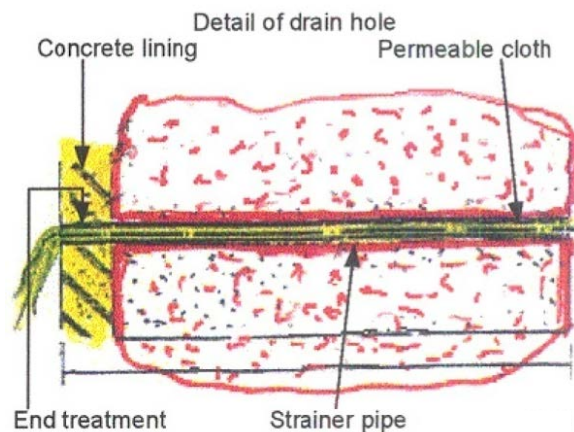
Radial drainage hole drilled through tunnel sidewall to relieve external water pressure. Strainer pipe is wrapped with a permeable cloth to prevent clogging (Russell, 2001).
